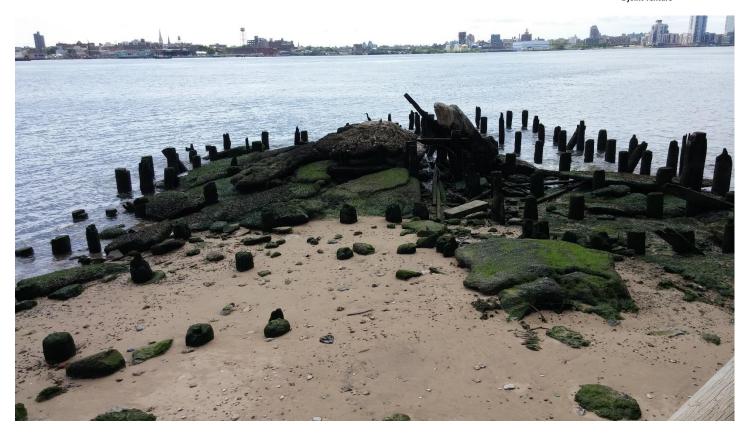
Intertidal sand flat associated with remains of derelict dock/pier. Photo taken facing southeast.
